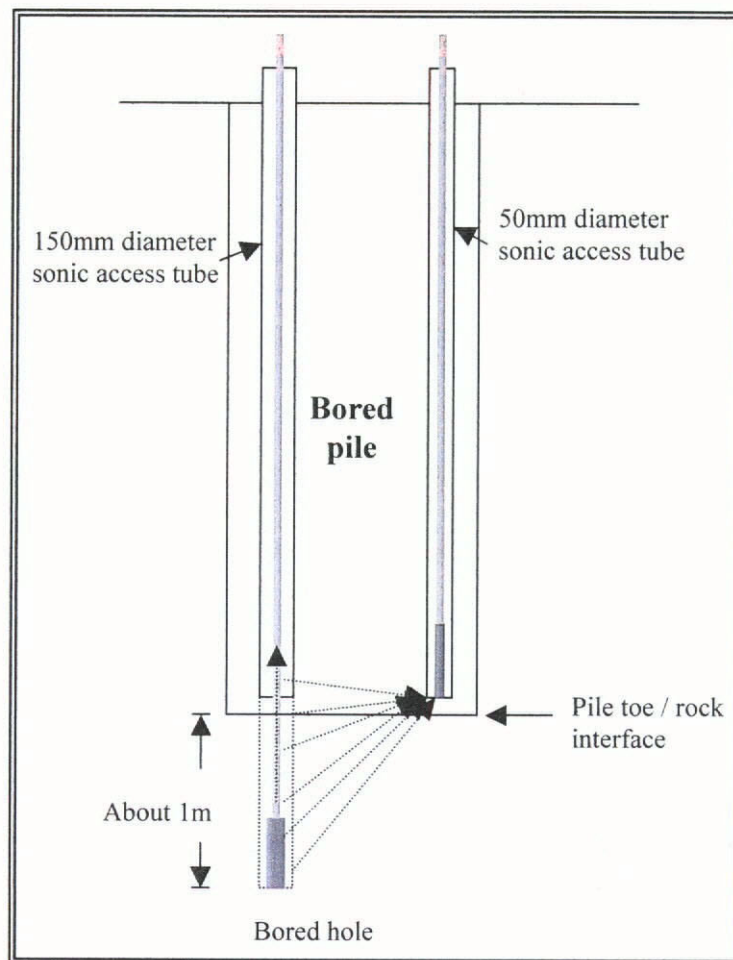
Schematic drawing showing the arrangement of the toe of a bored pile in performing a 'fan-shaped' test
